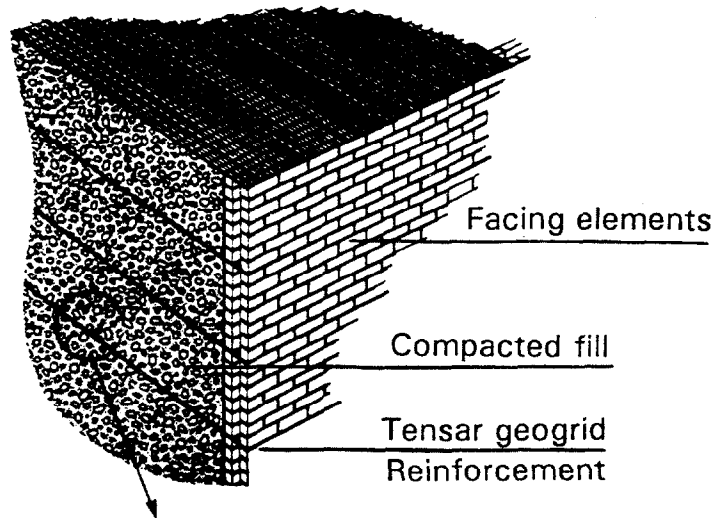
Schematic design of reinforced earth wall using strip reinforcement.<sup>(6)</sup>
